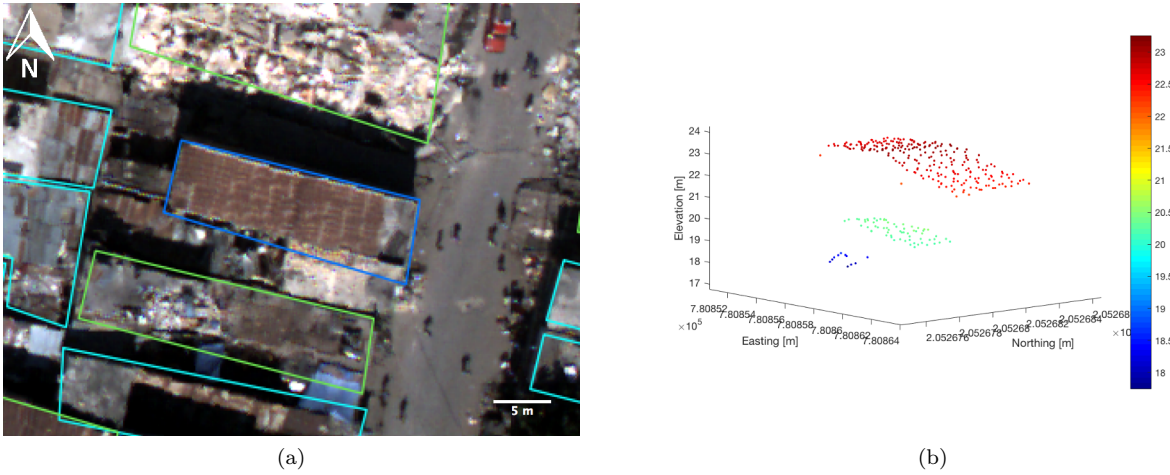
A damaged building is misclassified as undamaged because portions of the rooftop that fell off were too low to be considered, and the remaining roof remains planar: (a) Damage is visible in the image of the omitted building, outlined in blue; and (b) The corresponding point cloud of the building does not adequately represent the extent of the damage.
